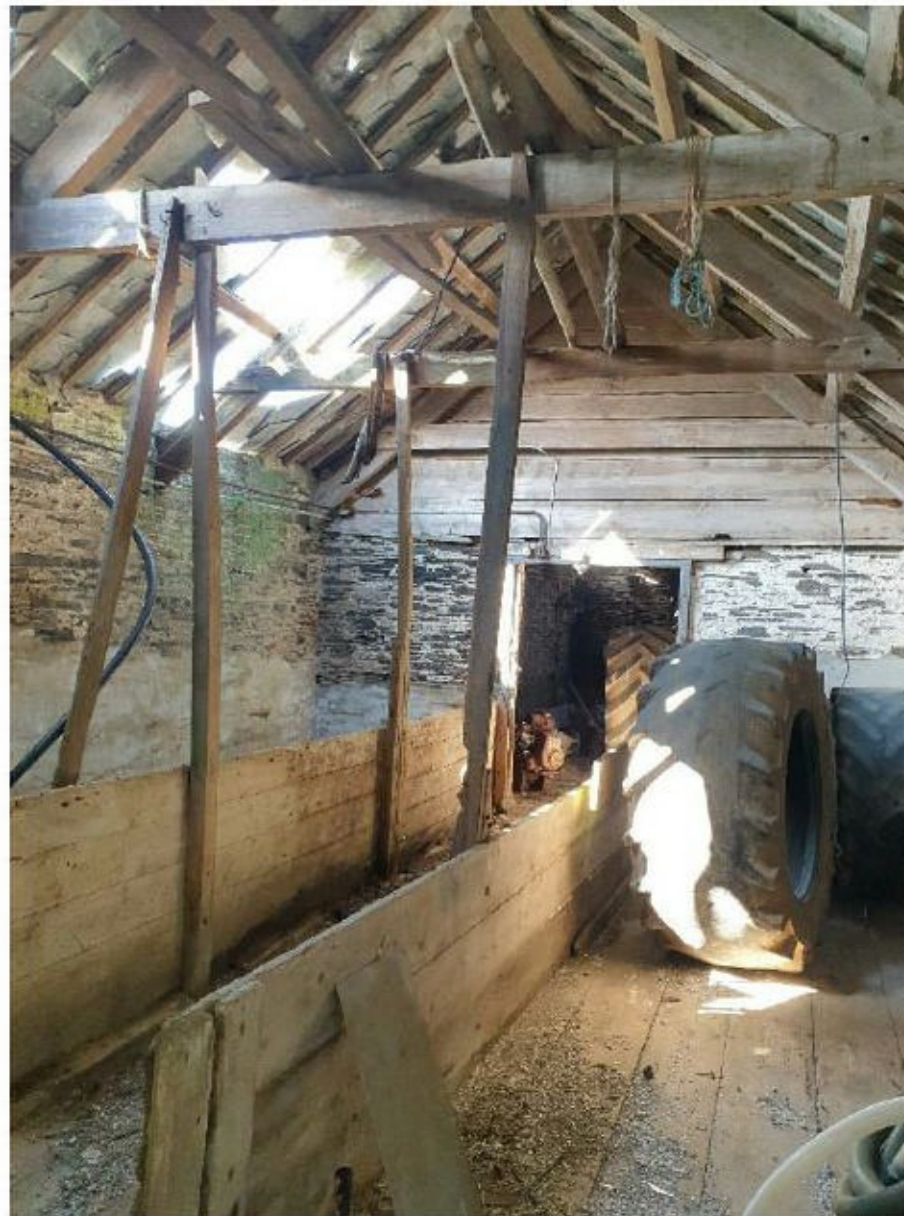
Interior of first-floor of Barn 1 at Porthmissen Farm (viewed towards the south west)
